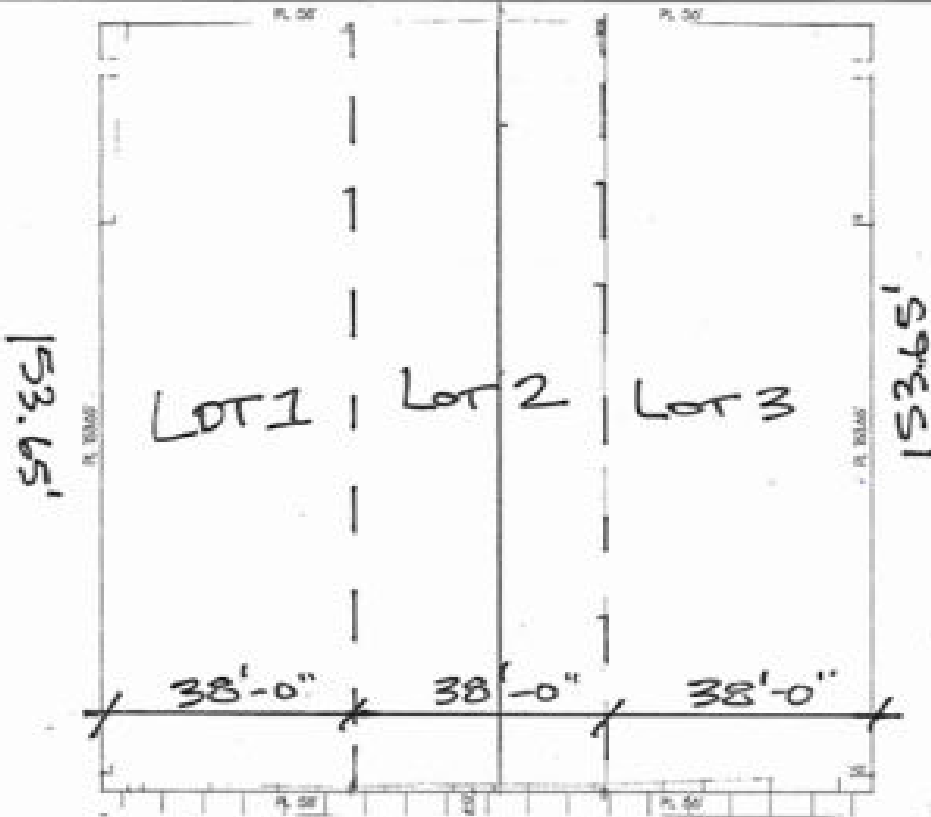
IMAGE SHOWING A SITE PLAN OF THE SITE
